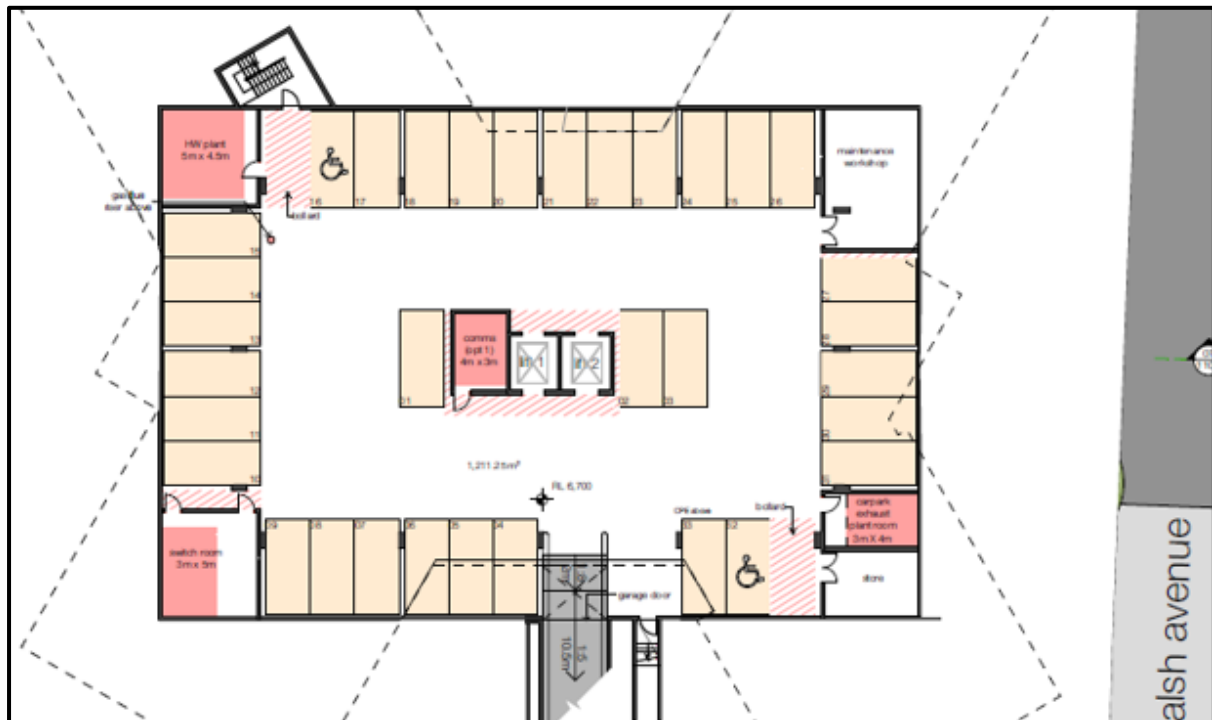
Approved B10 Basement Plan for DA-1183/2016
